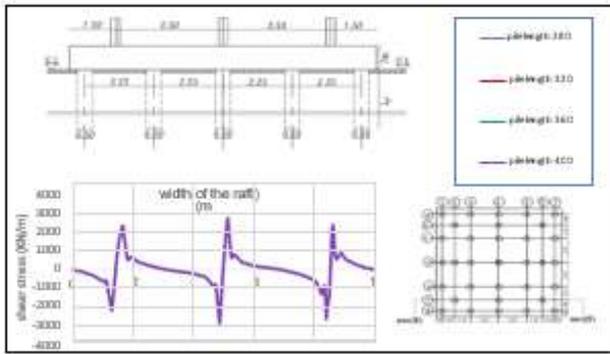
Relationship between pile length and raft shear force at Section B for a soil-contacting piled raft foundation.
